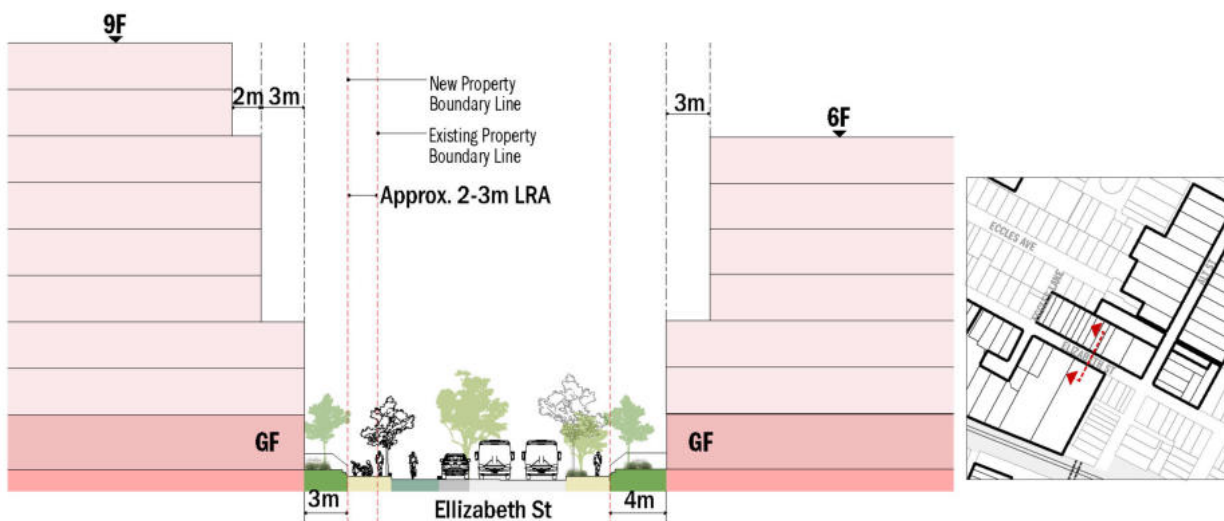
Ashfield Centre North – Elizabeth Street Section (West of Alt Street)
